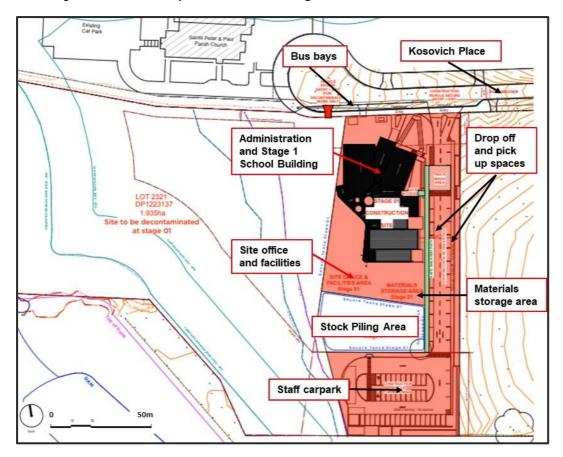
| Stage 1 site construction configuration and layout (Source: Applicant's EIS 2018)
